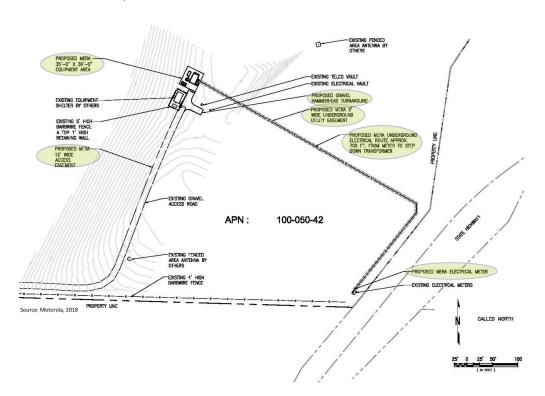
Site 20 - Tomales Enlarged Site Plan
